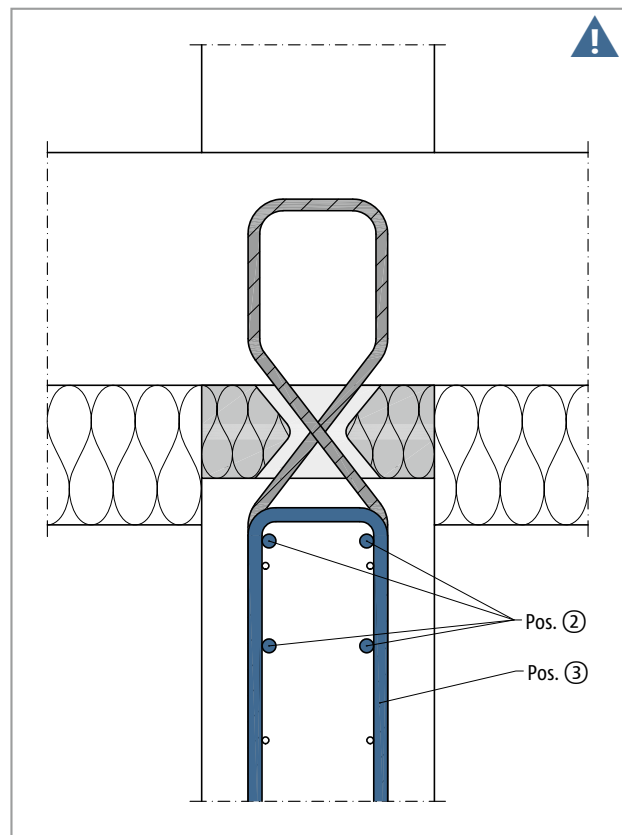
Schöck Sconnex® type W-N-VH: On-site reinforcement variant B; steel bar Pos. 2 supports the shear force bars of the Schöck Sconnex® against the inside of the reinforced concrete component
